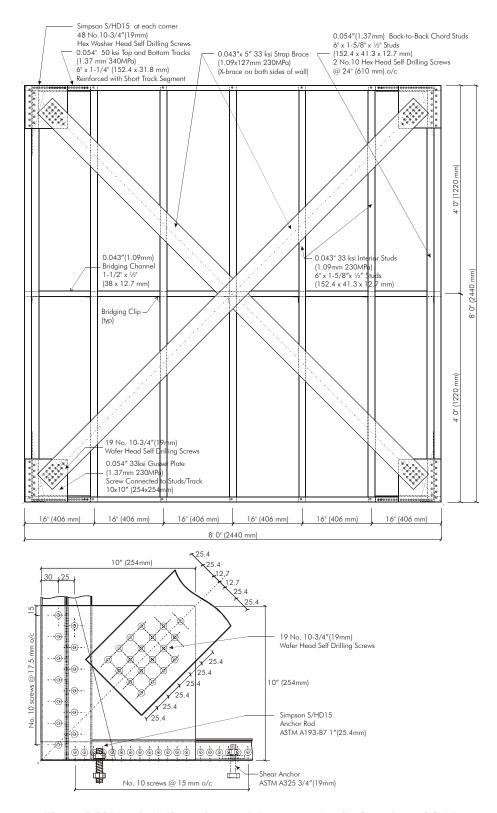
Nominal dimensions and the corner detail of specimen 9C-M
